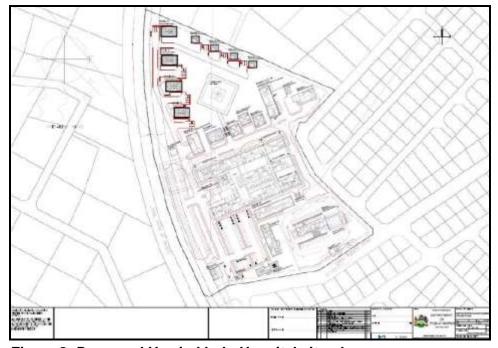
Proposed Umzimkhulu Hospital site-plan.
